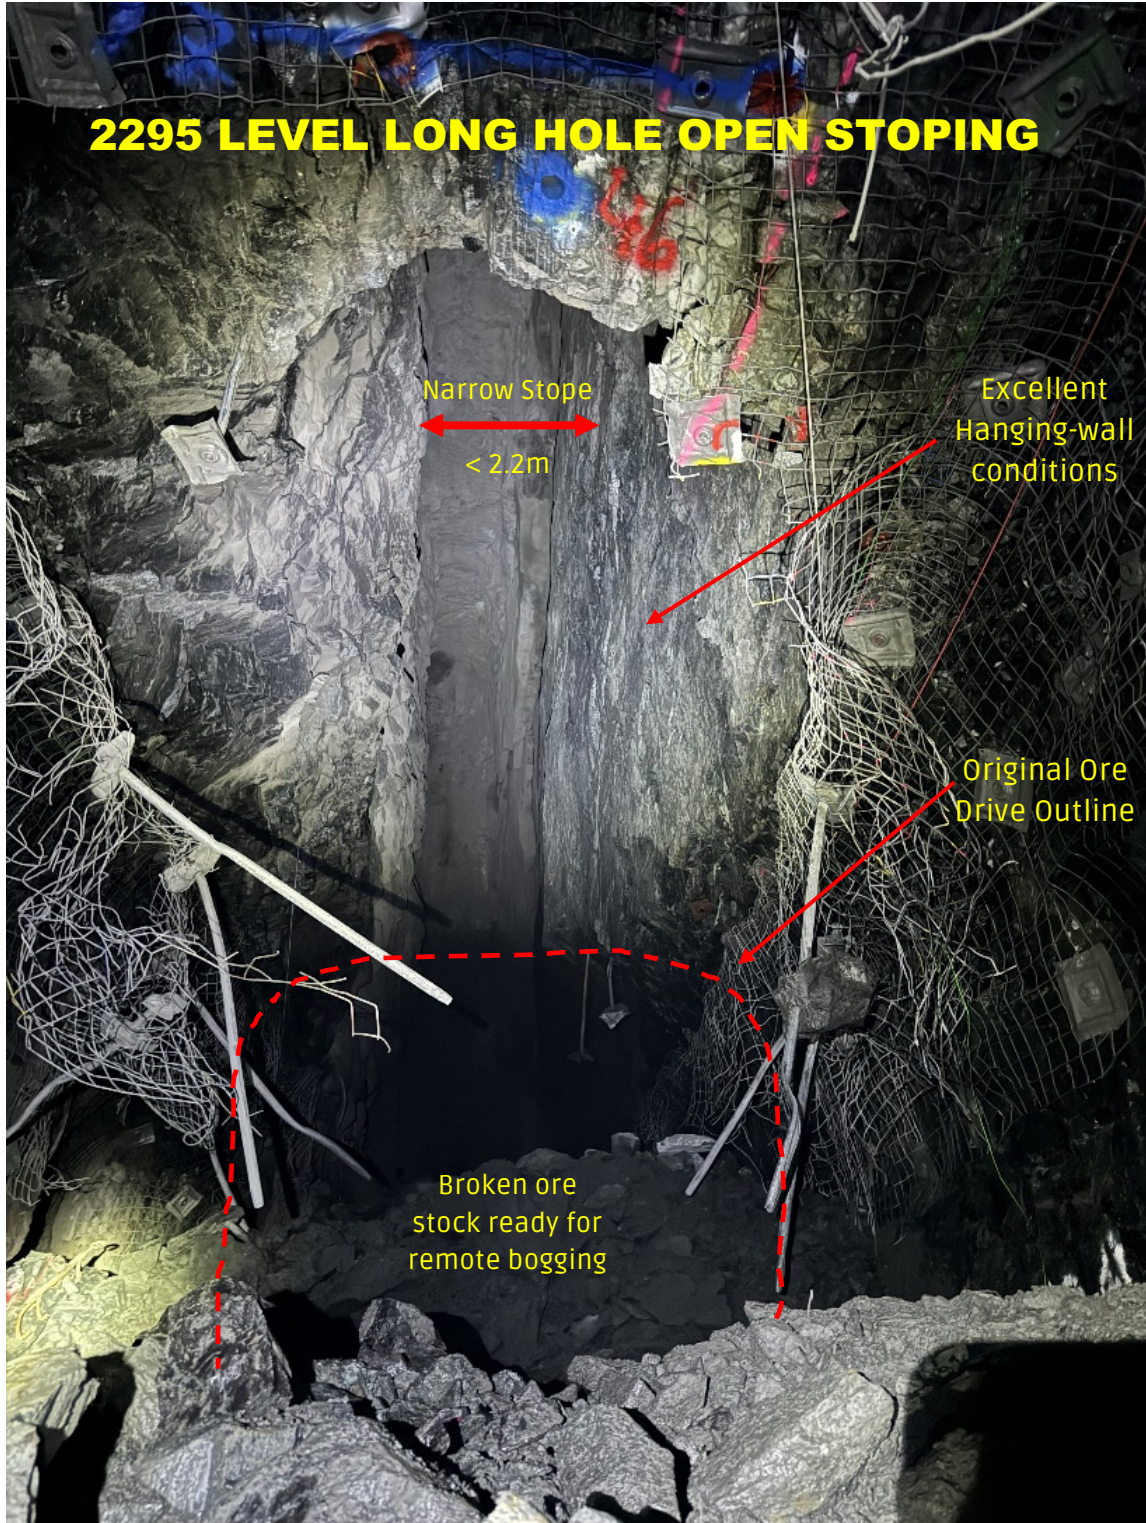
Looking north into first stope on the 2295 Level – noting good ground conditions (hanging wall surface)
